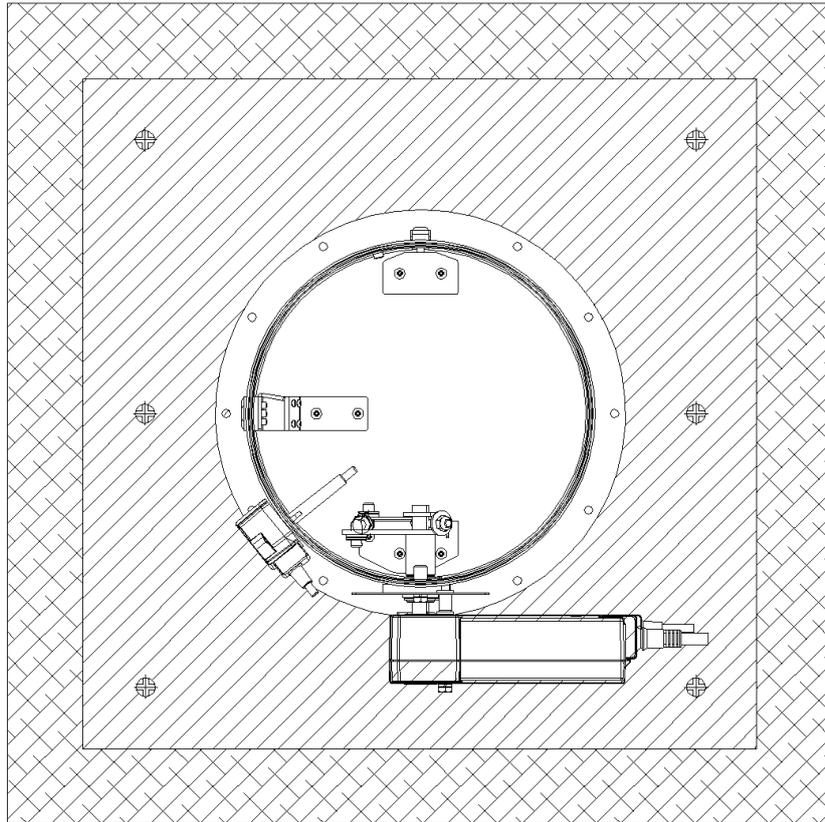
Installation method of fire dampers KTS-O in flexible wall with vertical rotation axis of baffle
